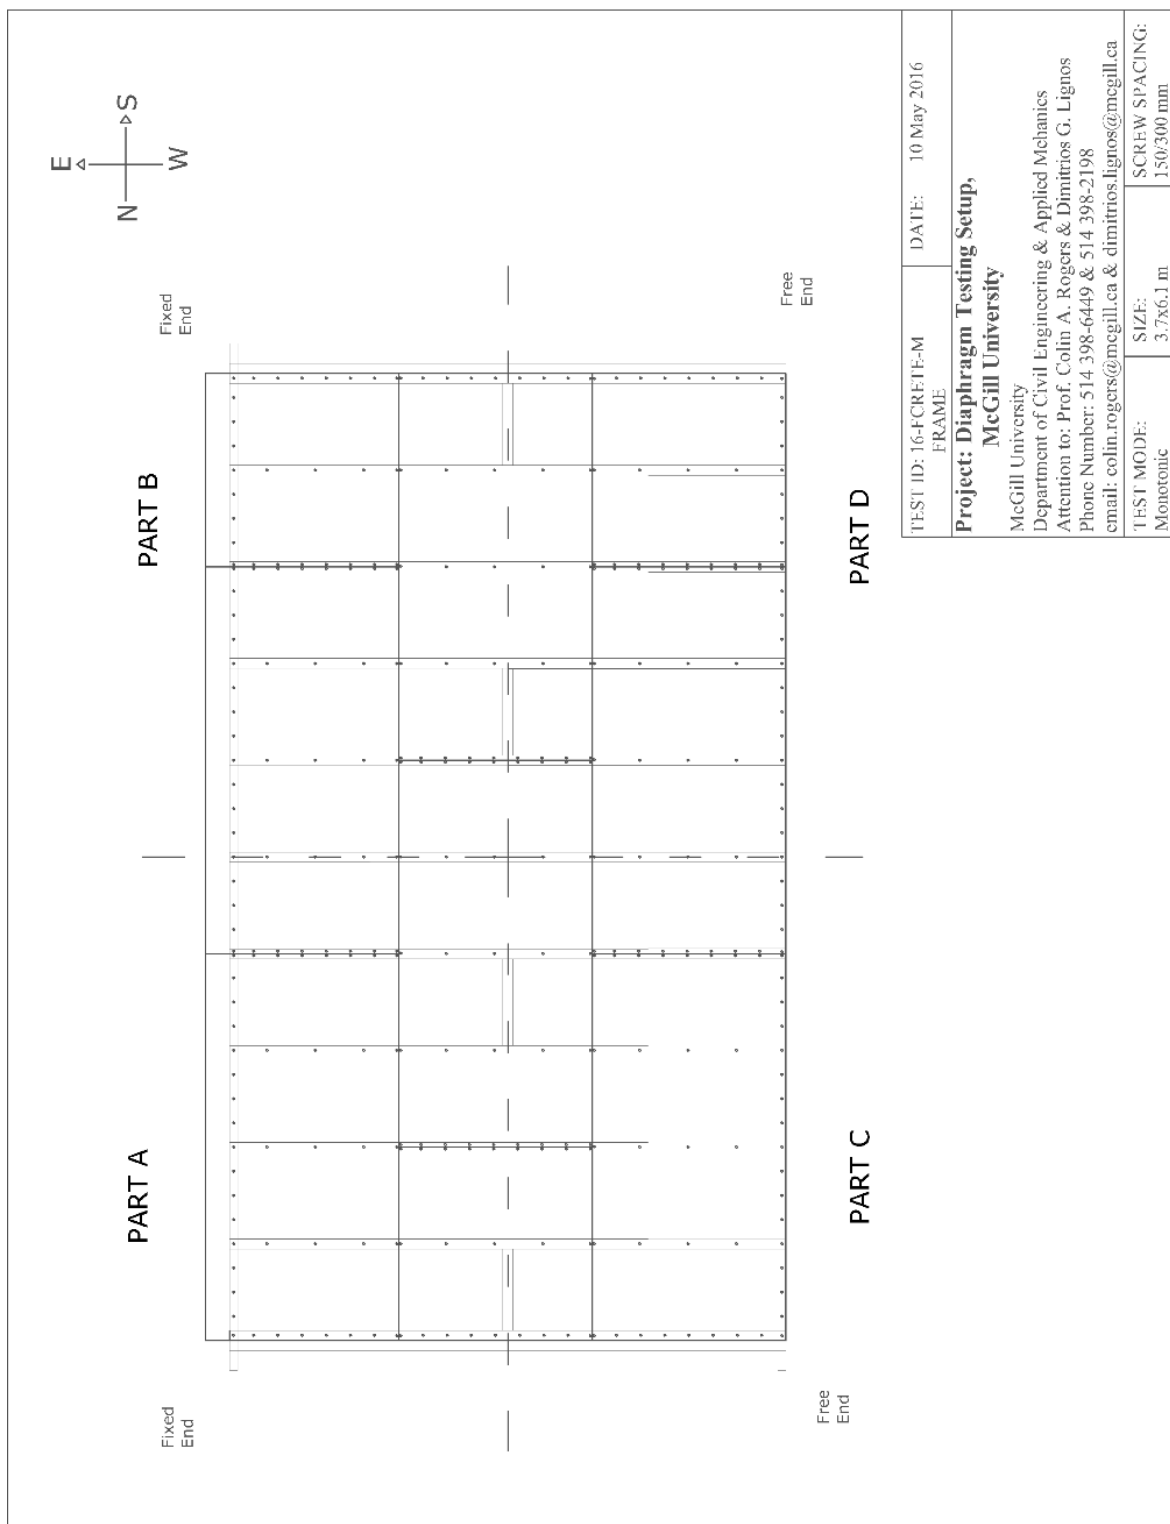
Sheathing Fastener Placement for Specimen 16-FCRETE-M
